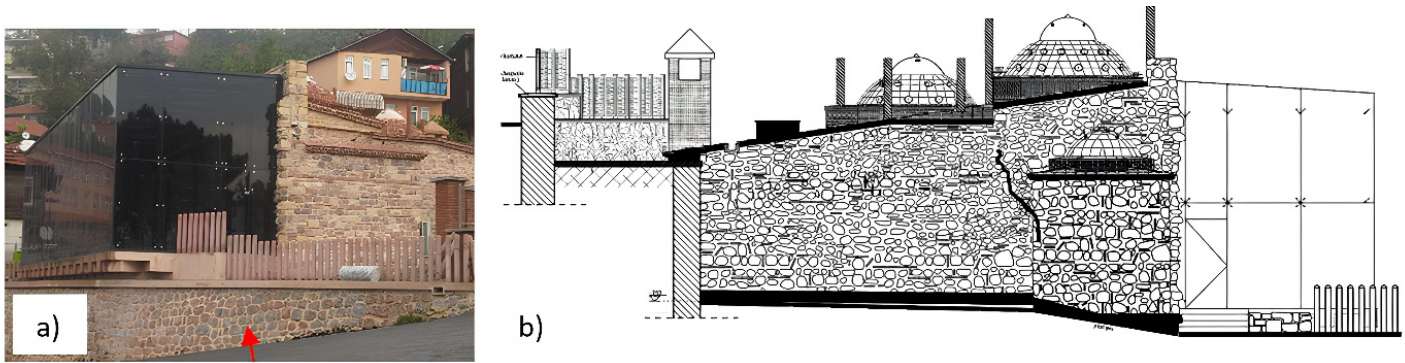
a) Süleyman Pasha Bath sections after repair b) Suleyman Pasha Bath Northwest Facade. Source: Güner Design - Architect Gülhan Dilaver.
